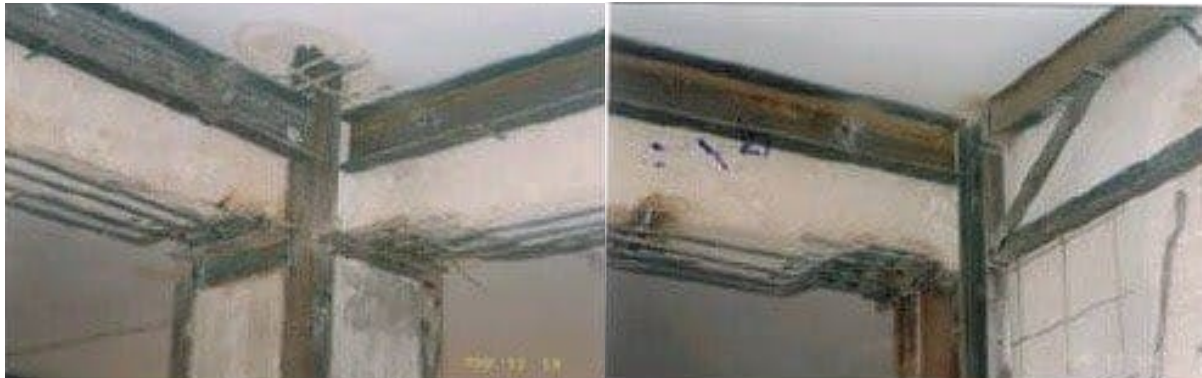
Strengthening a beam, slab & column (left) and Strengthening of beam and slab (right) (credit: researchgate)
